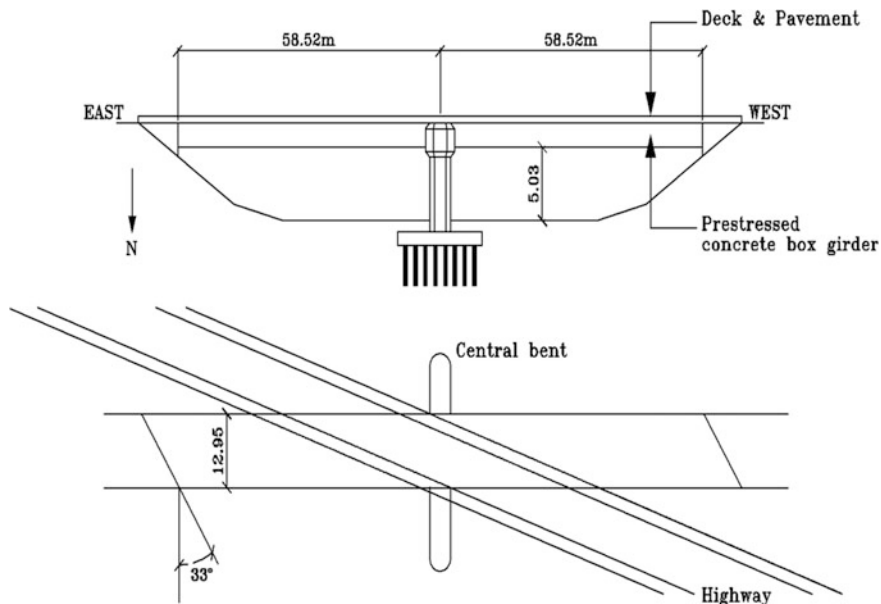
Elevation and plan view of the 91/5 highway over-crossing
